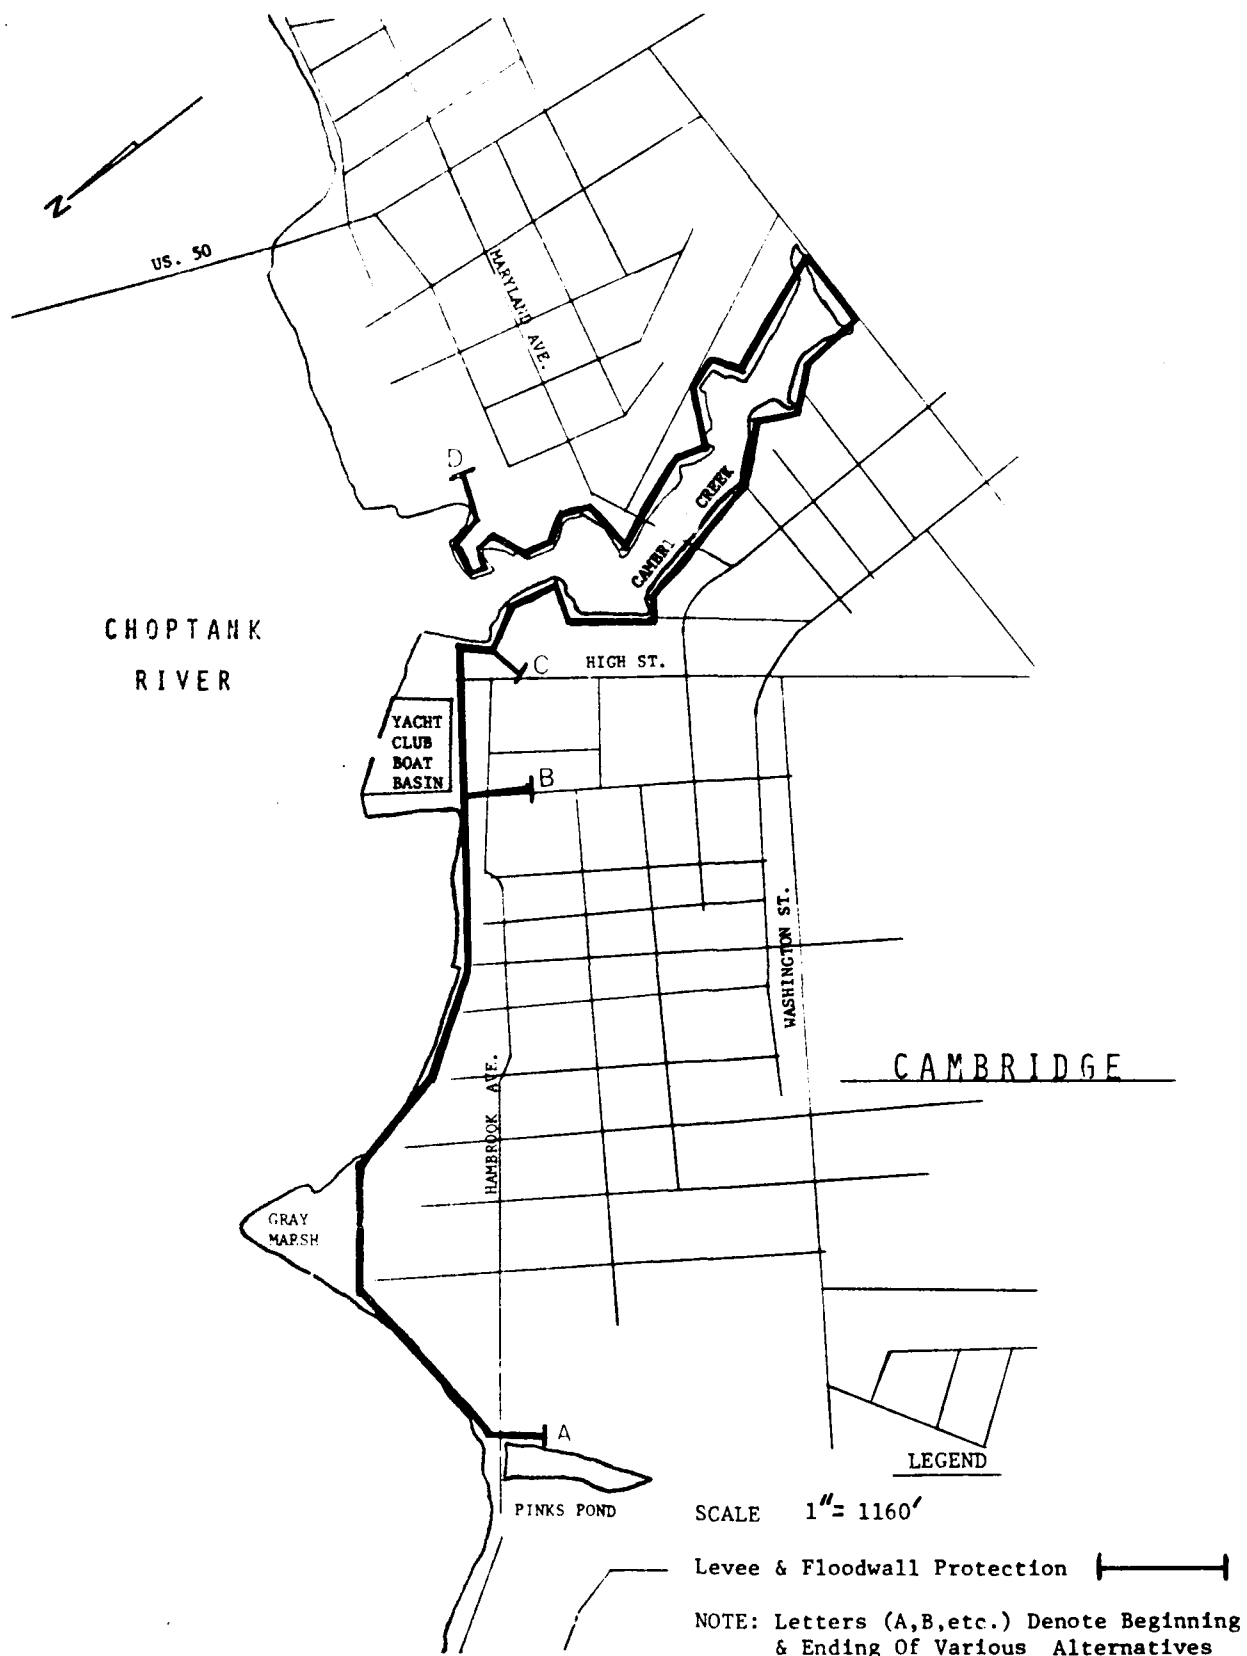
PLAN LOCATION OF STRUCTURAL MEASURES FOR CAMBRIDGE, MARYLAND
